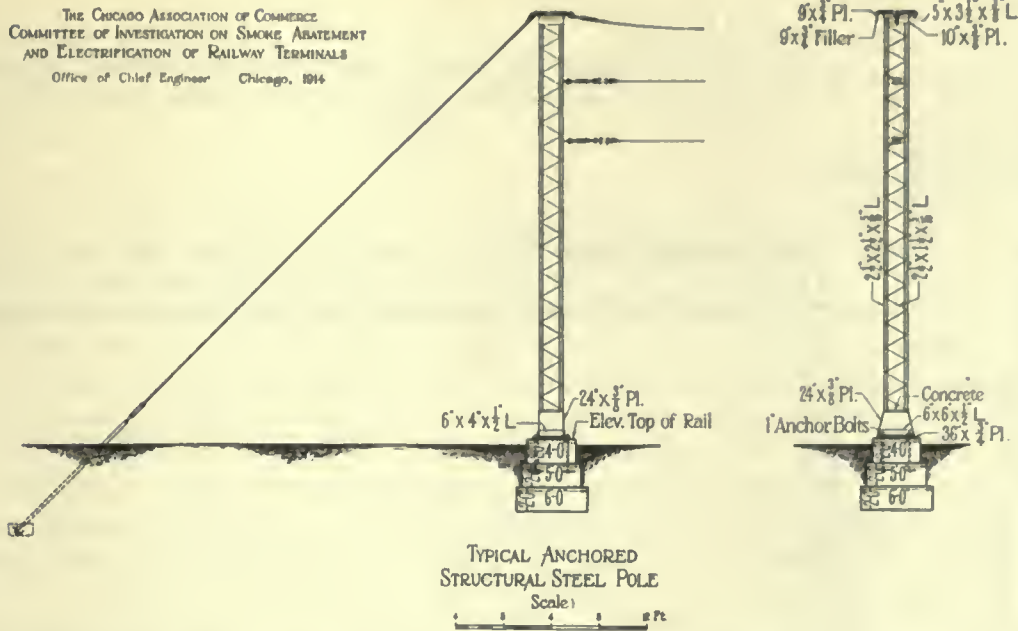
TYPICAL STRUCTURAL STEEL END POLE FOR CROSS CATENARY YARD TRACK CONSTRUCTION
